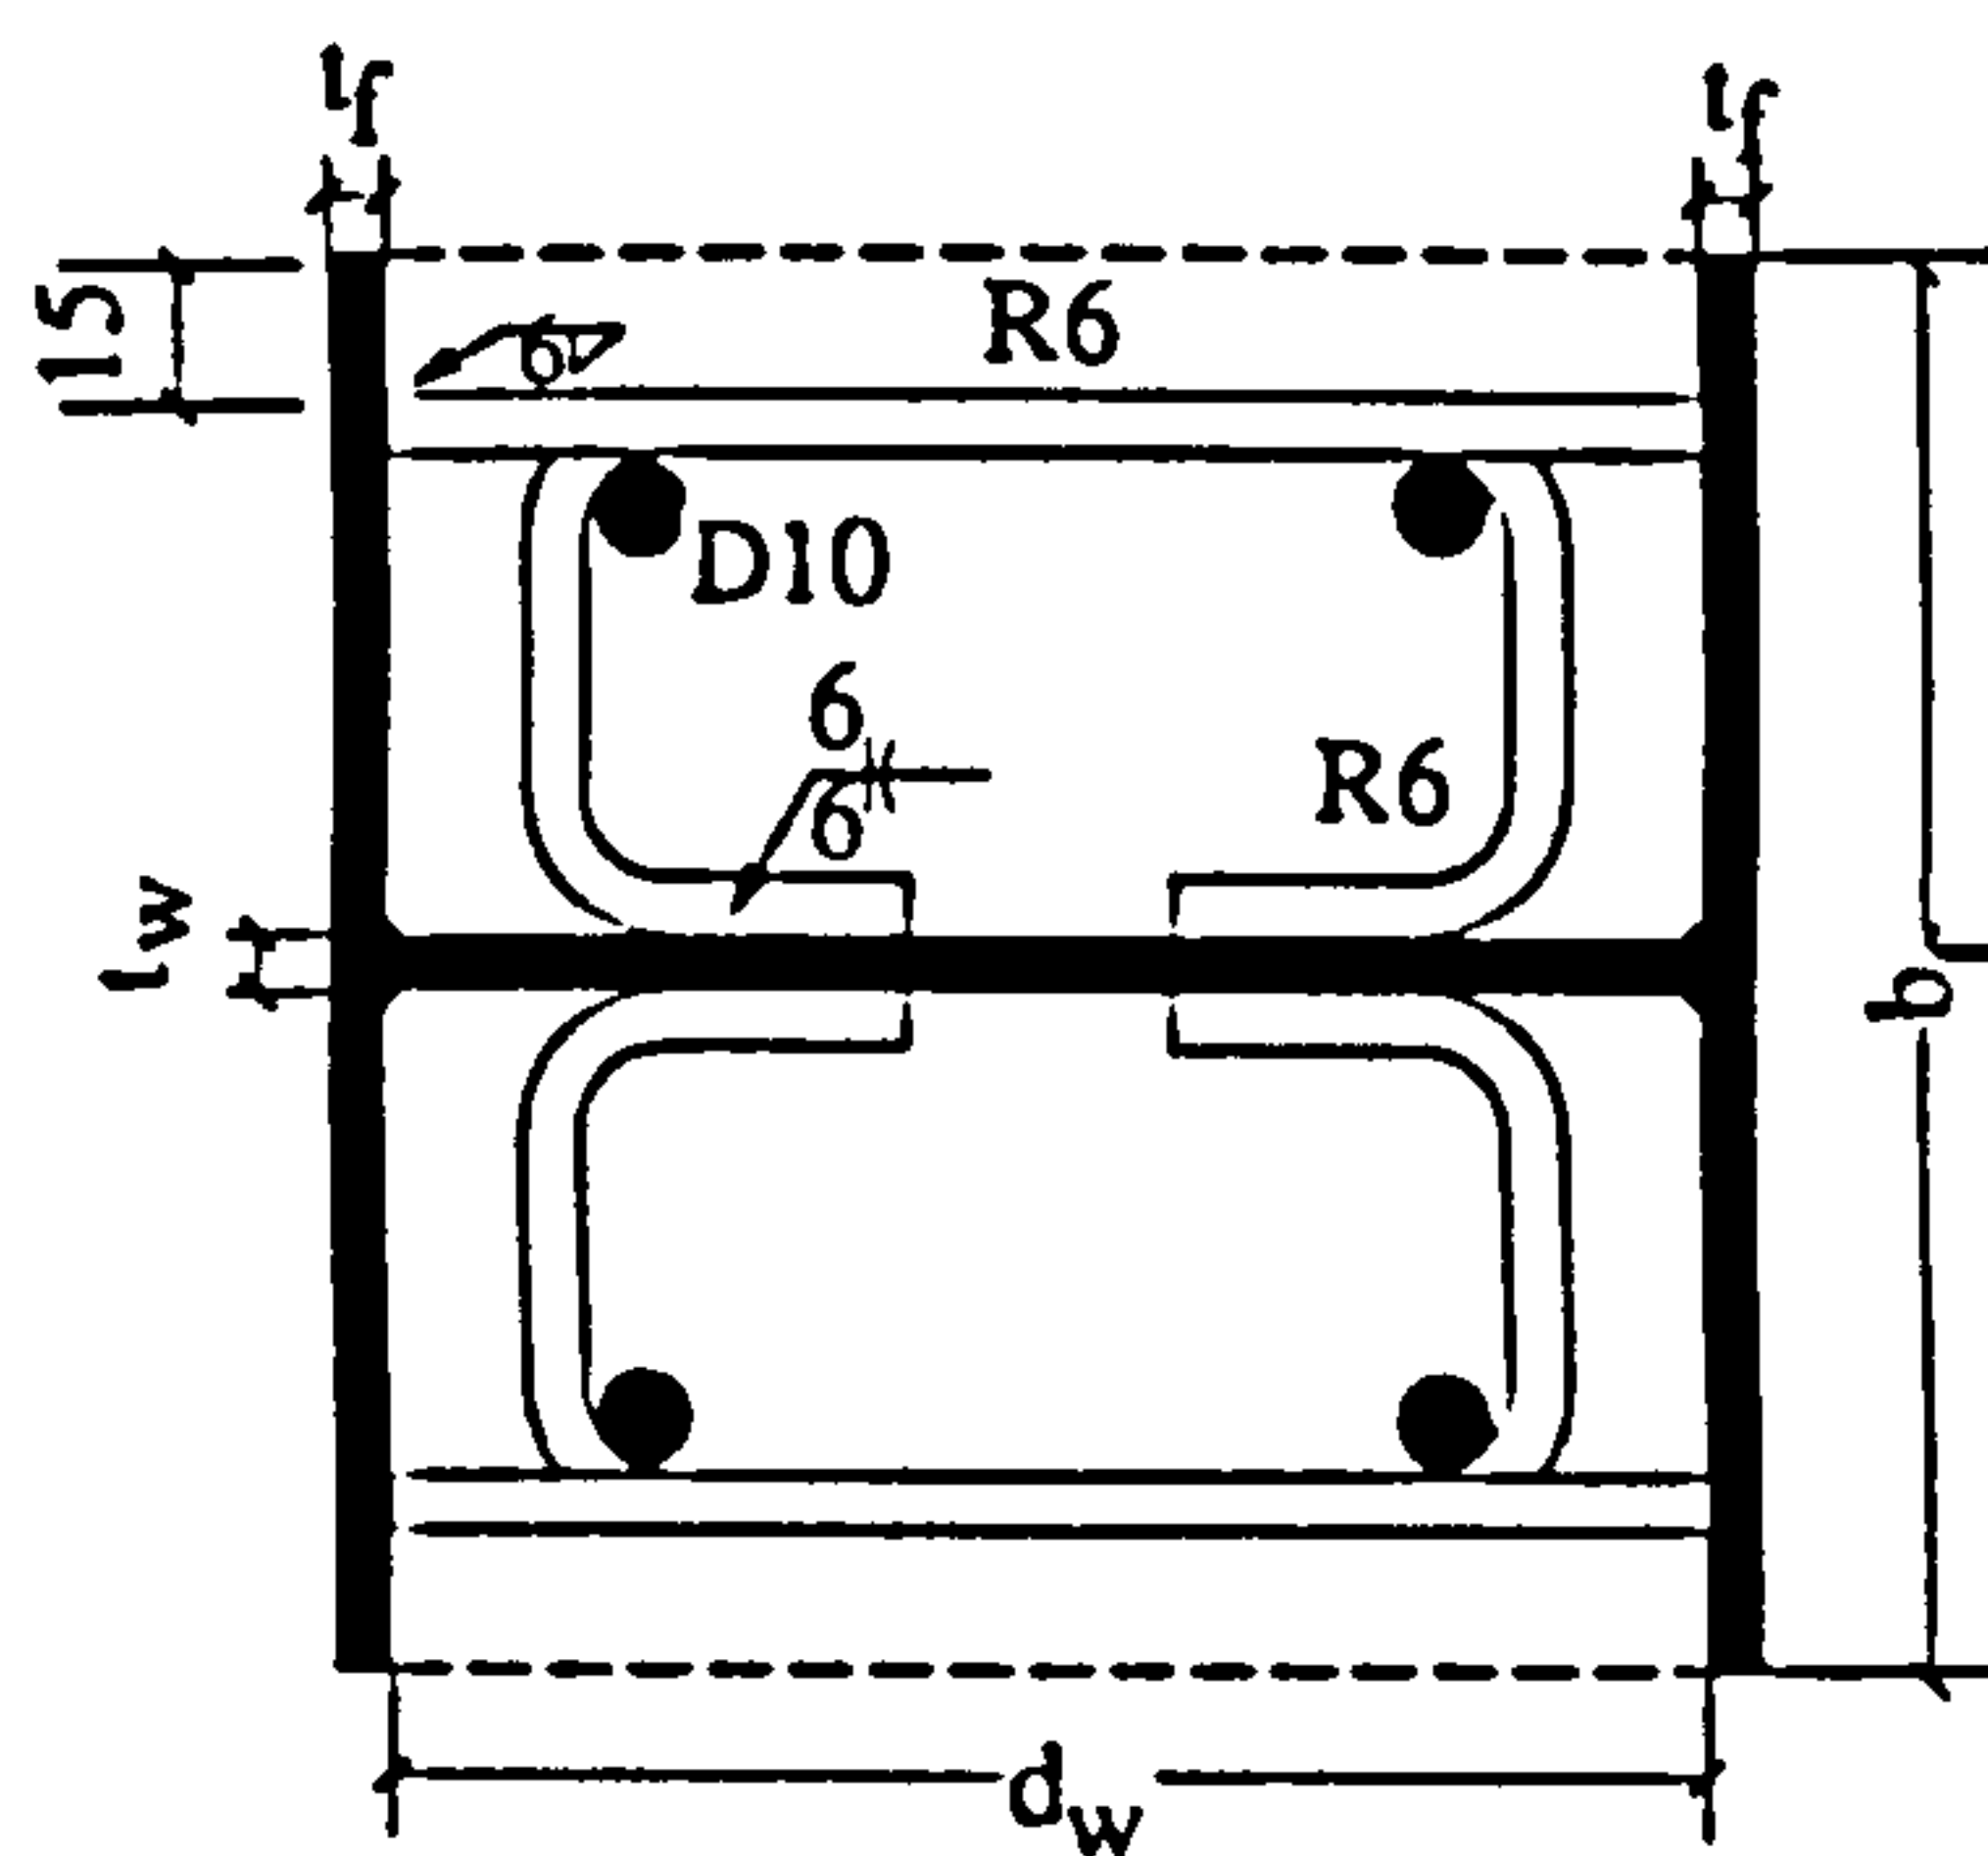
Details of models EM01, EM02 and EM03 (dimensions in mm)
